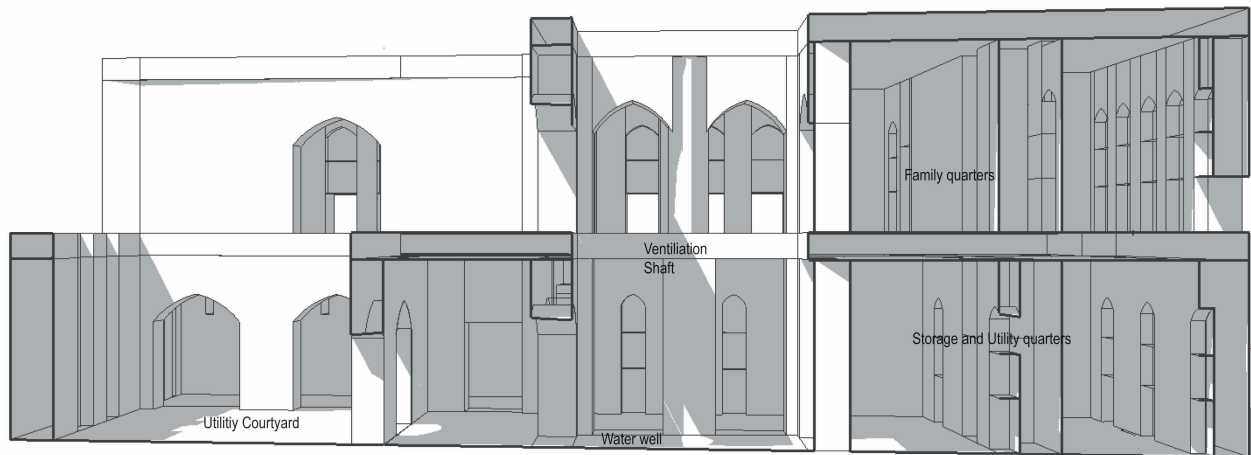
→ MFA cross section perspective (reconstruction, not to scale)
